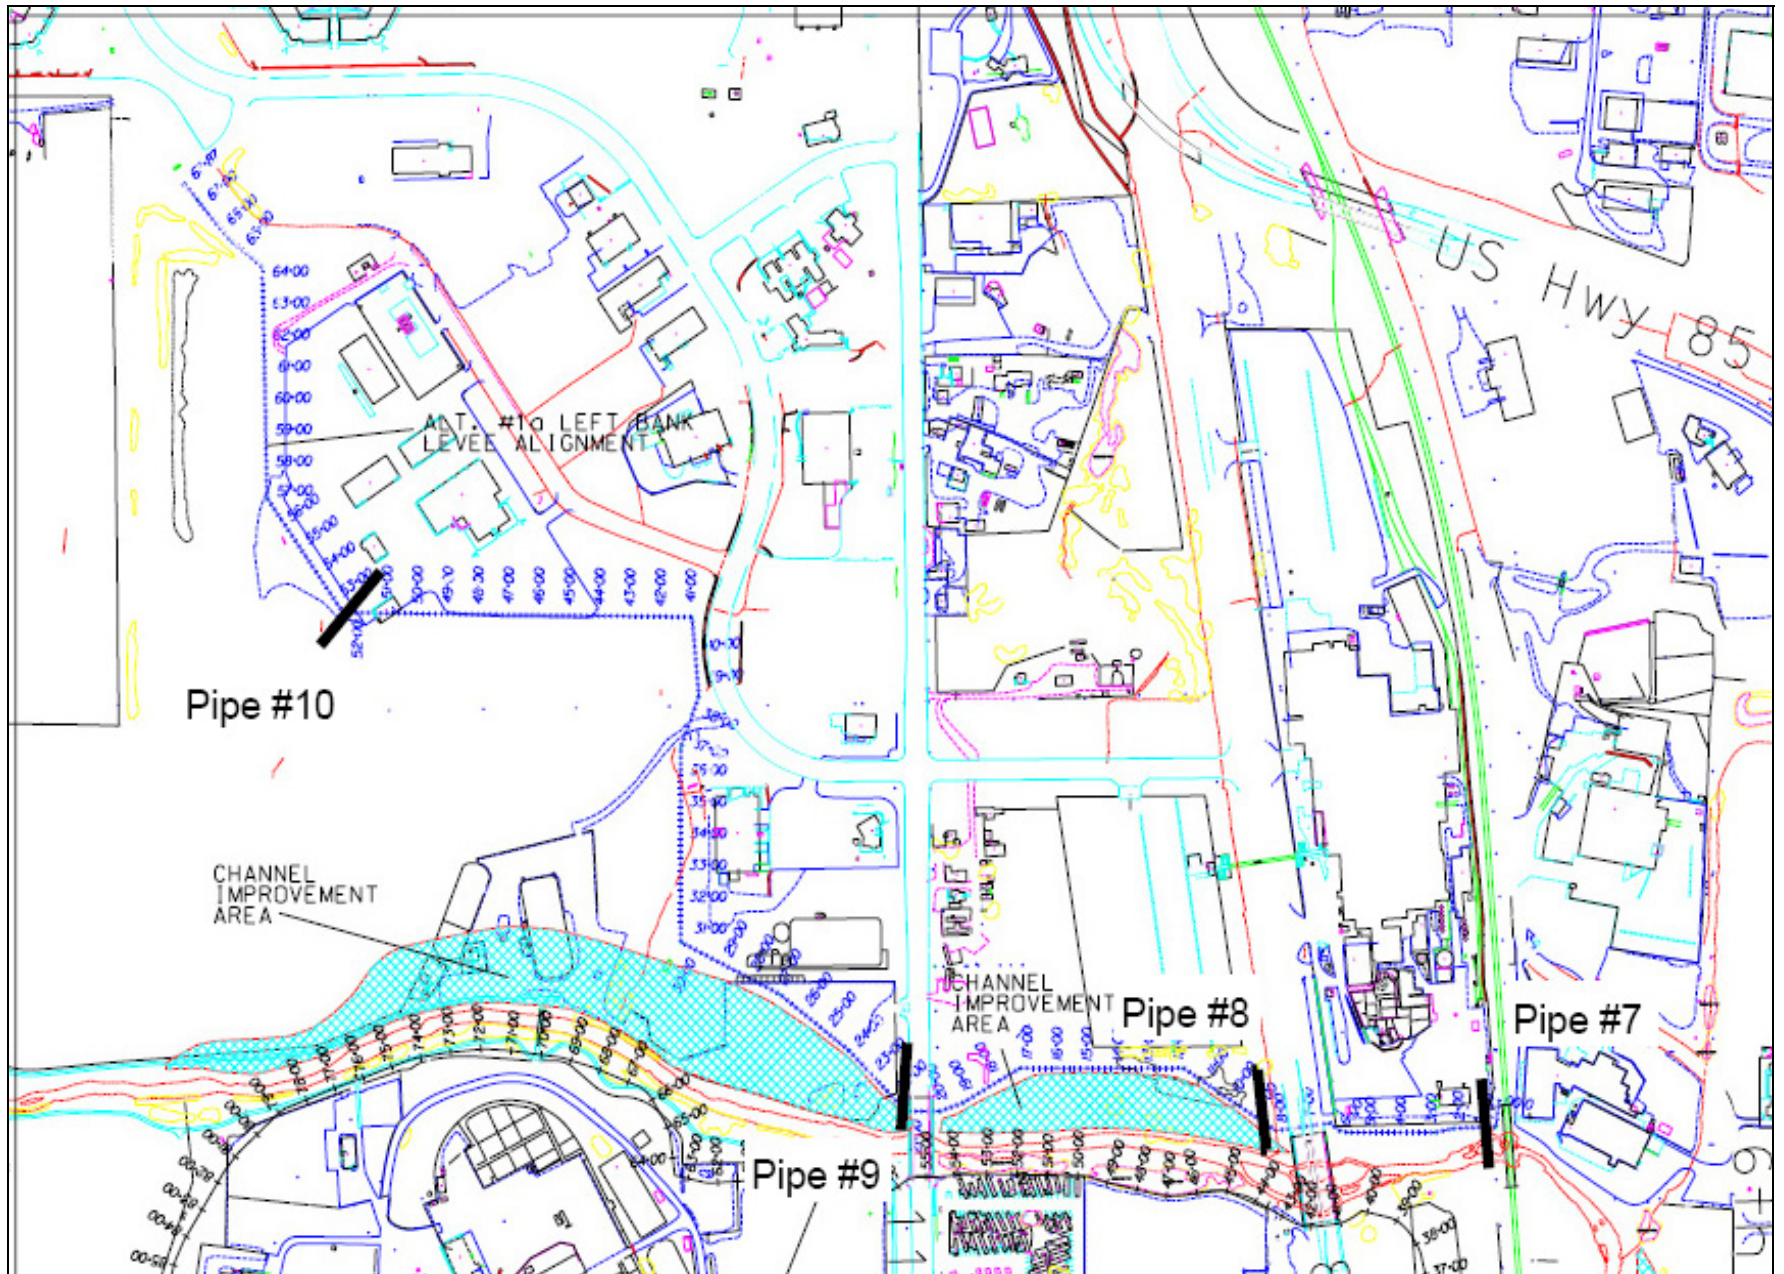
Interior Drainage Structure Location. Alternative 1a.
